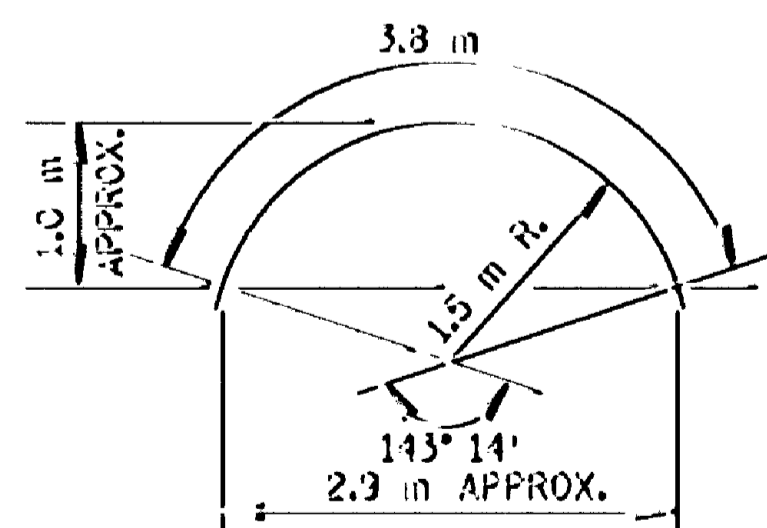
PLATE BEAM NOSE ⑤ (1.5 m RADIUS)
